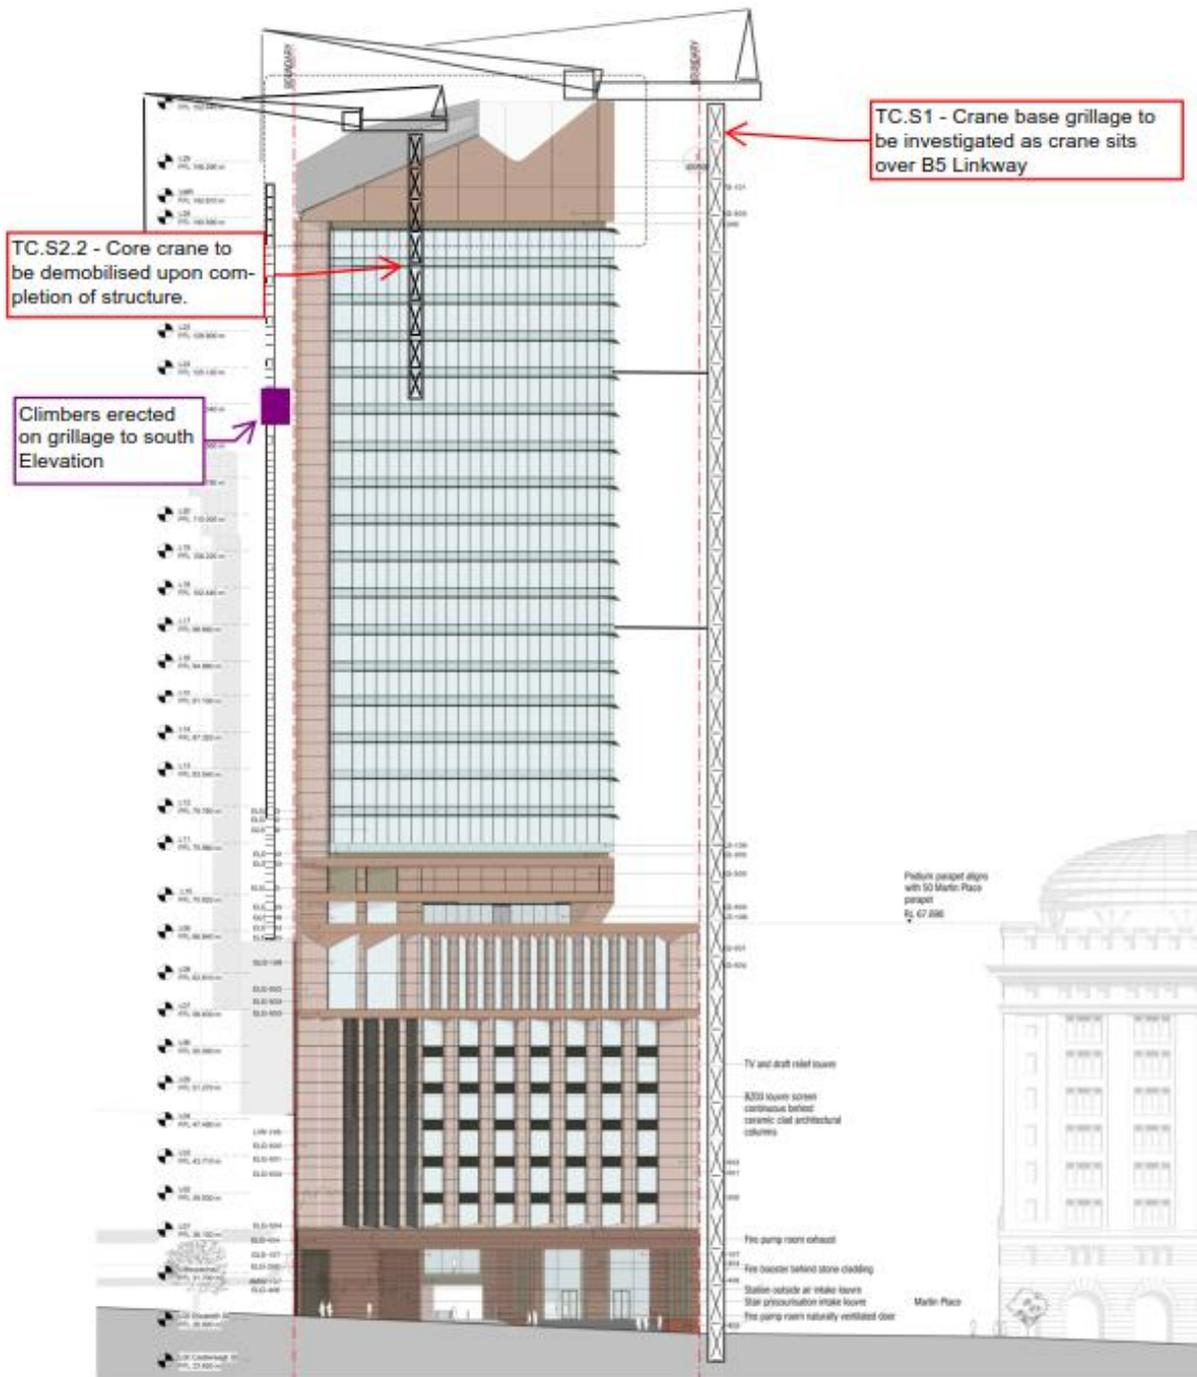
South Tower – Materials Handling Plan – Cranes & High Climbers
